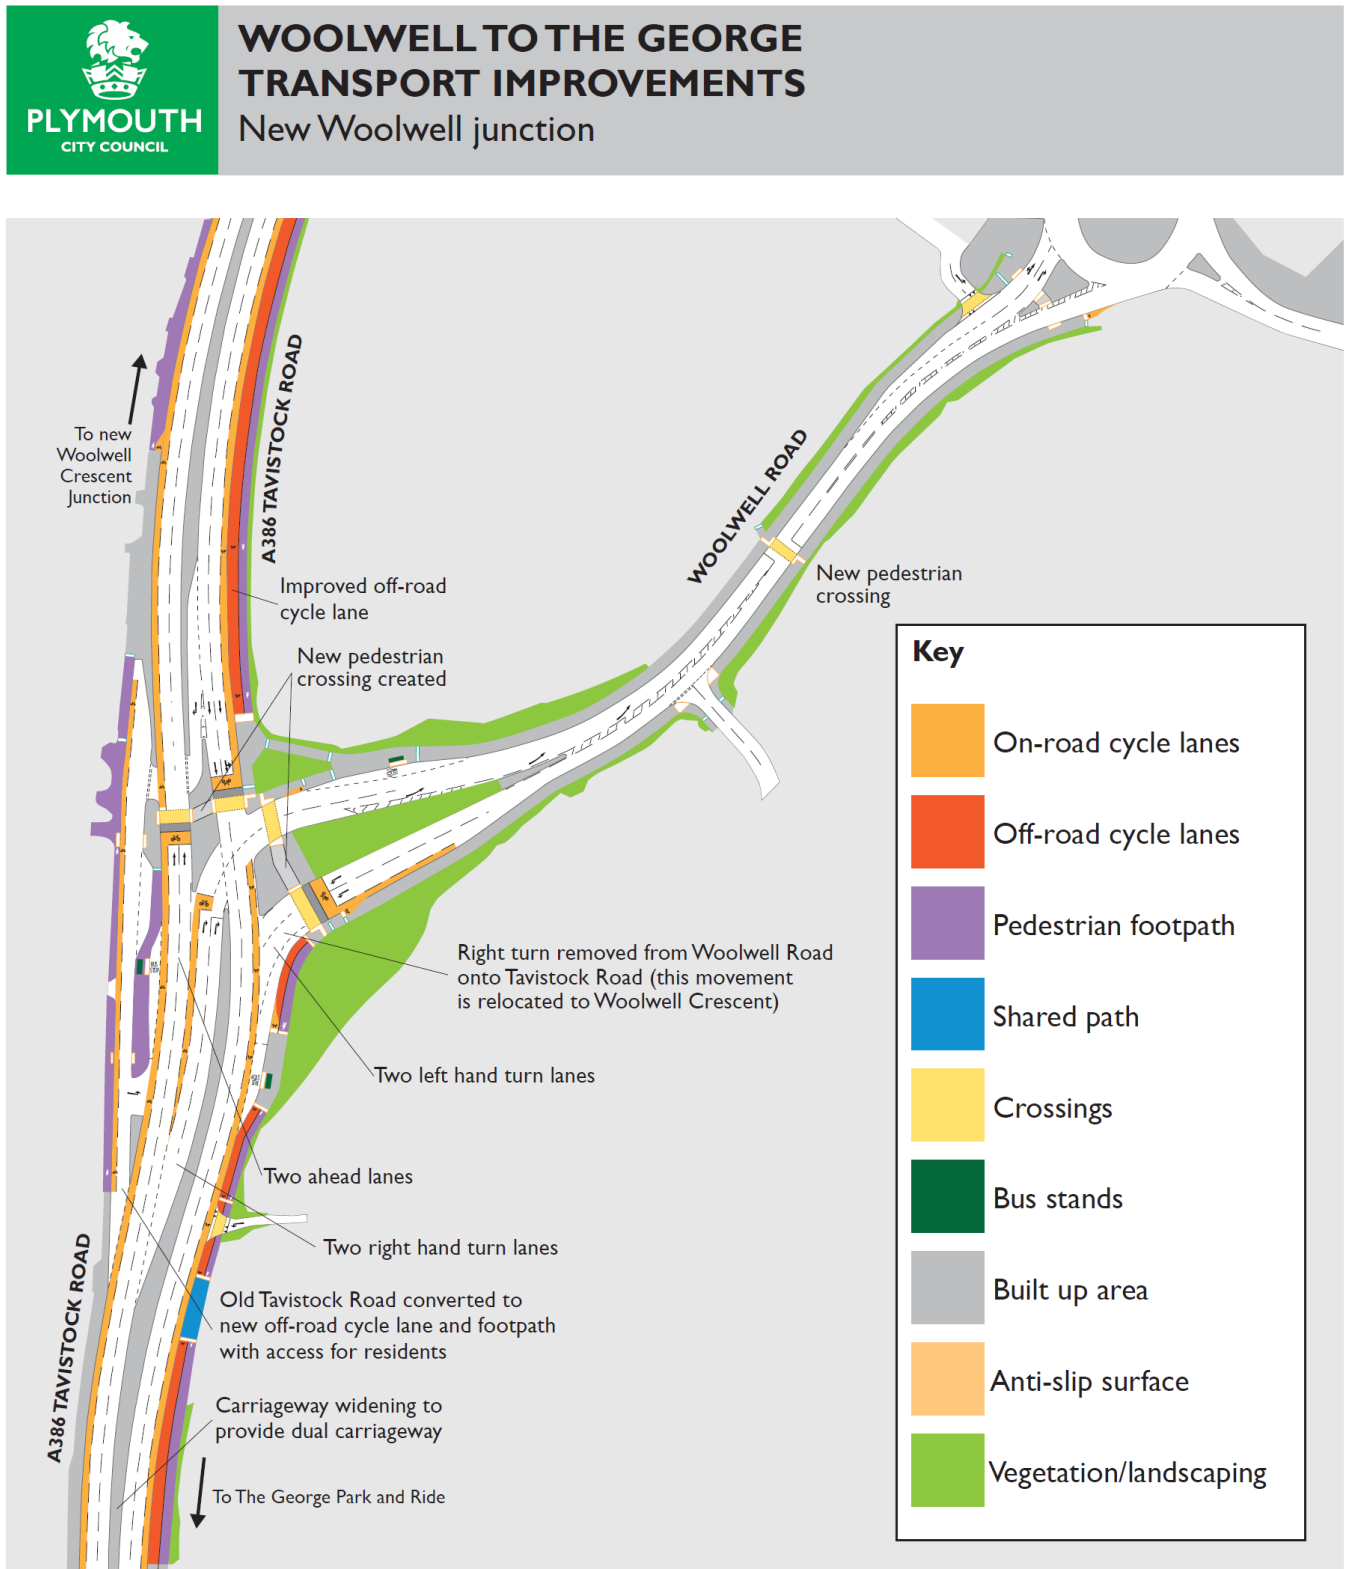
A386 Tavistock Road/Woolwell Road New Junction
